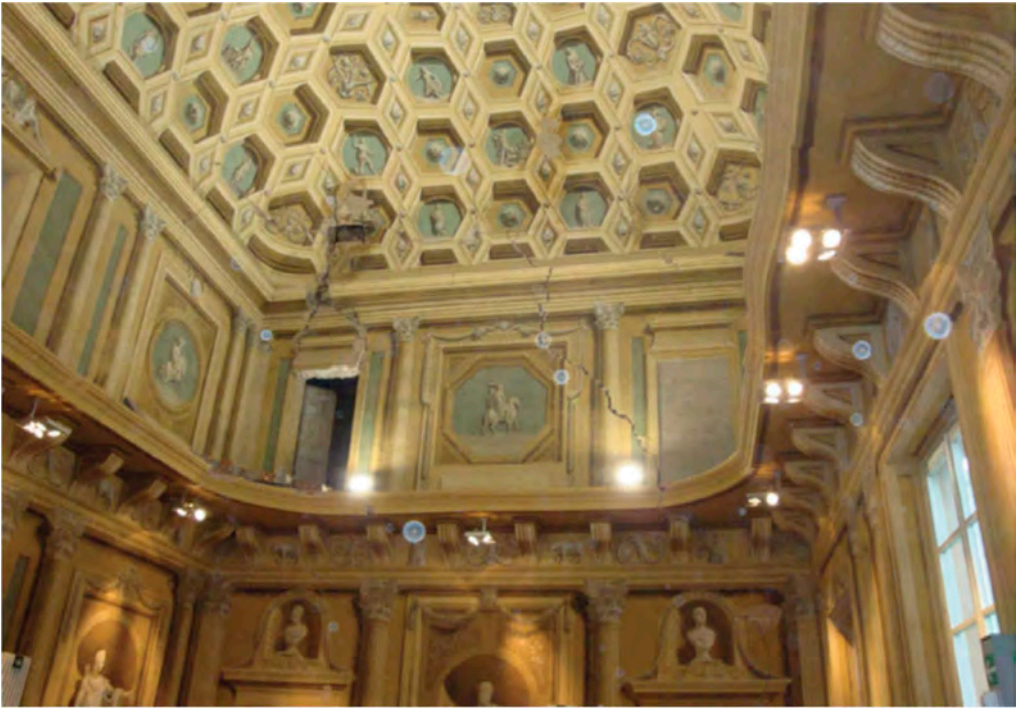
The hall immediately after the earthquake and before the safety devices was installed. Deep cracks in the ceiling and walls.
